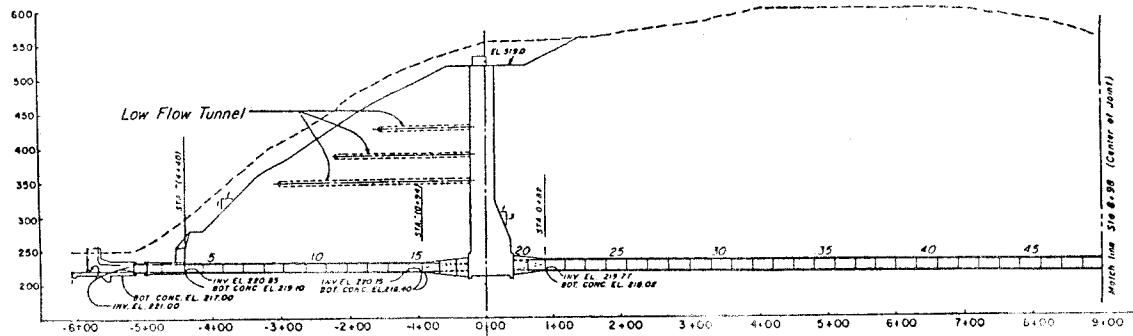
Centerline profile of outlet works, Warm Springs Dam
